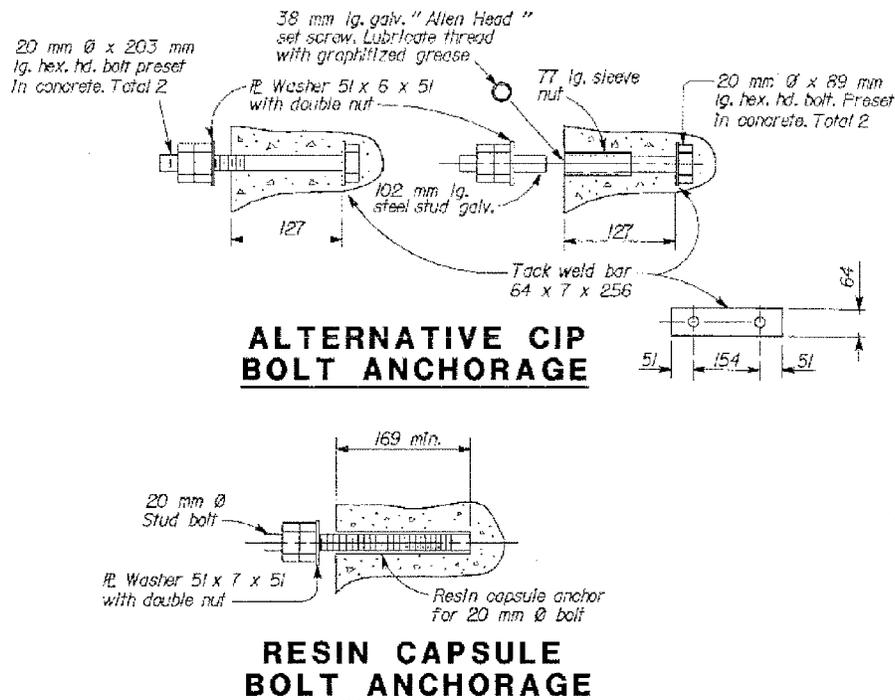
Example from a Bridge Mounted Sign Structure Drawing showing anchorage details.
